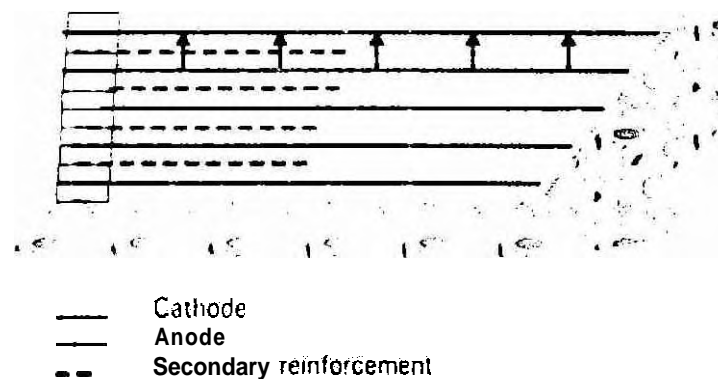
Construction of a vertical soil structure with super soft clay. In each lift the previous cathode becomes the anode and the previous anode is left in place as a reinforcing element (arrows depict upwards movement of water).
